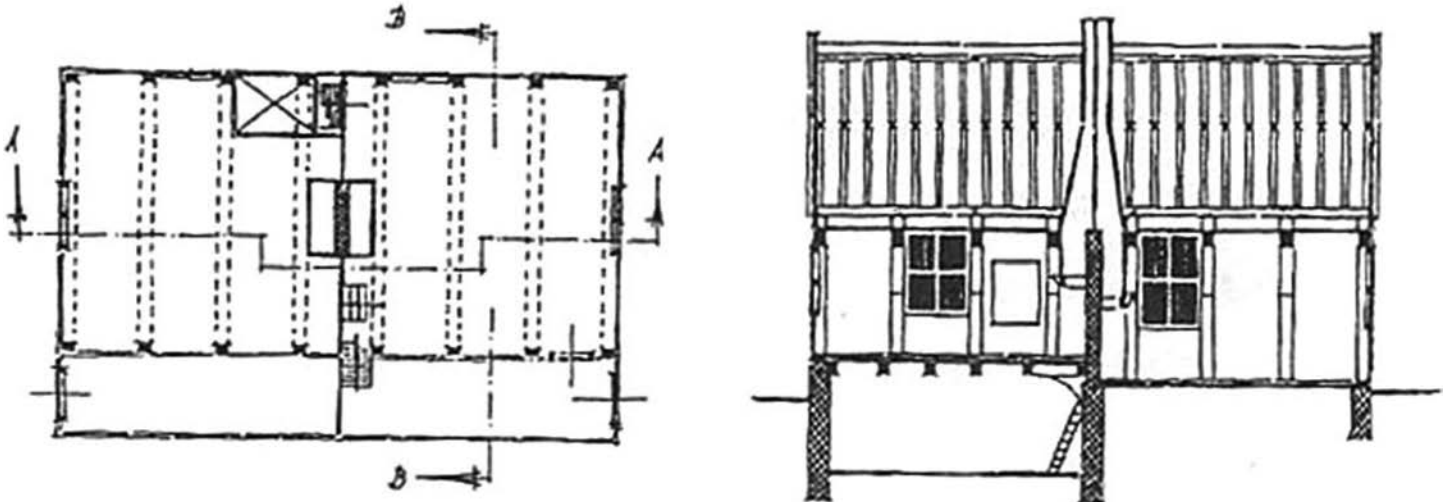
David Traver House, Stonehouse Road, Clinton, ca.1764.
